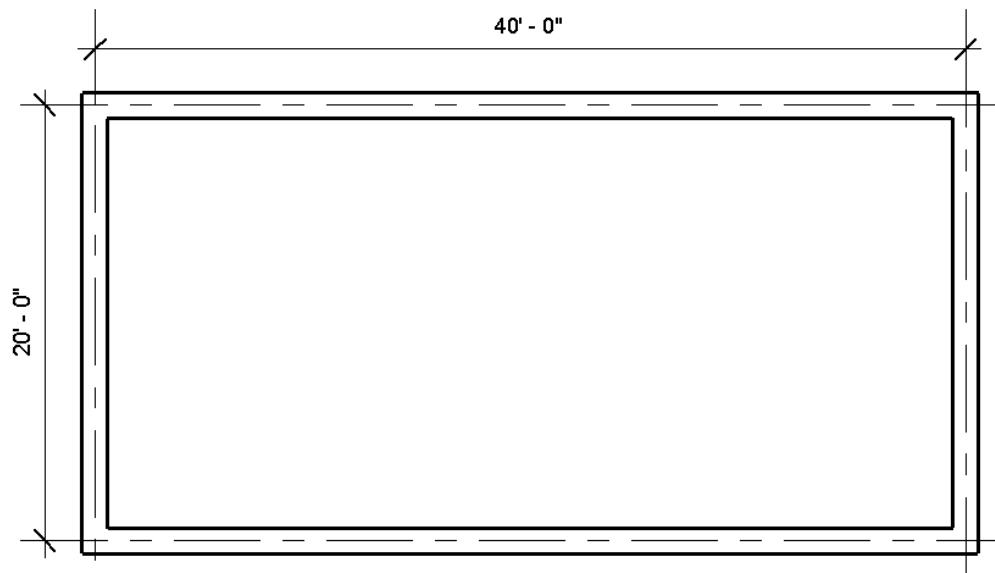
Sketch plan for creating exterior walls for the Apartment 1 project
